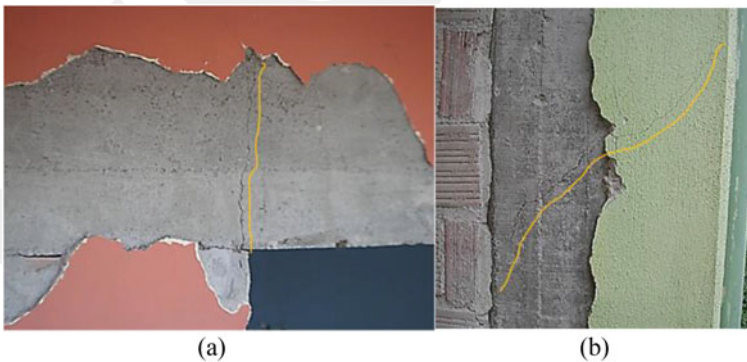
Examples of Type A Damage Category; a flexural damage; b shear damage
